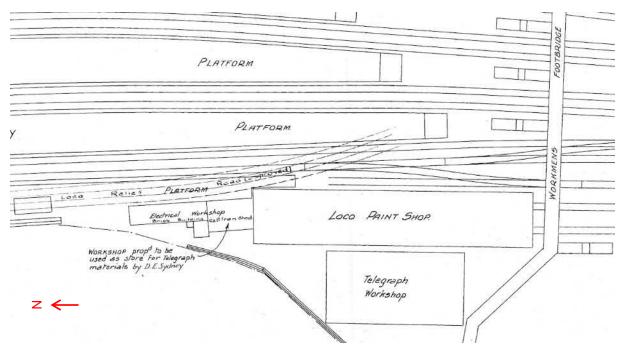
Undated plan showing Platform 1 Office referred to as the Electrical Workshop (Source: Sydney Trains Virtual Plan Room)
